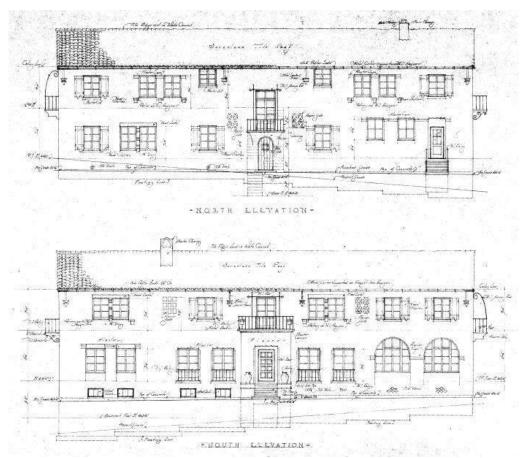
Drawings of the primary and rear elevations of Building 2 (Grace L. Trevor Cottage) by Reed & Corlett, 1929. Source: Permit A39344, Oakland Building Department.
